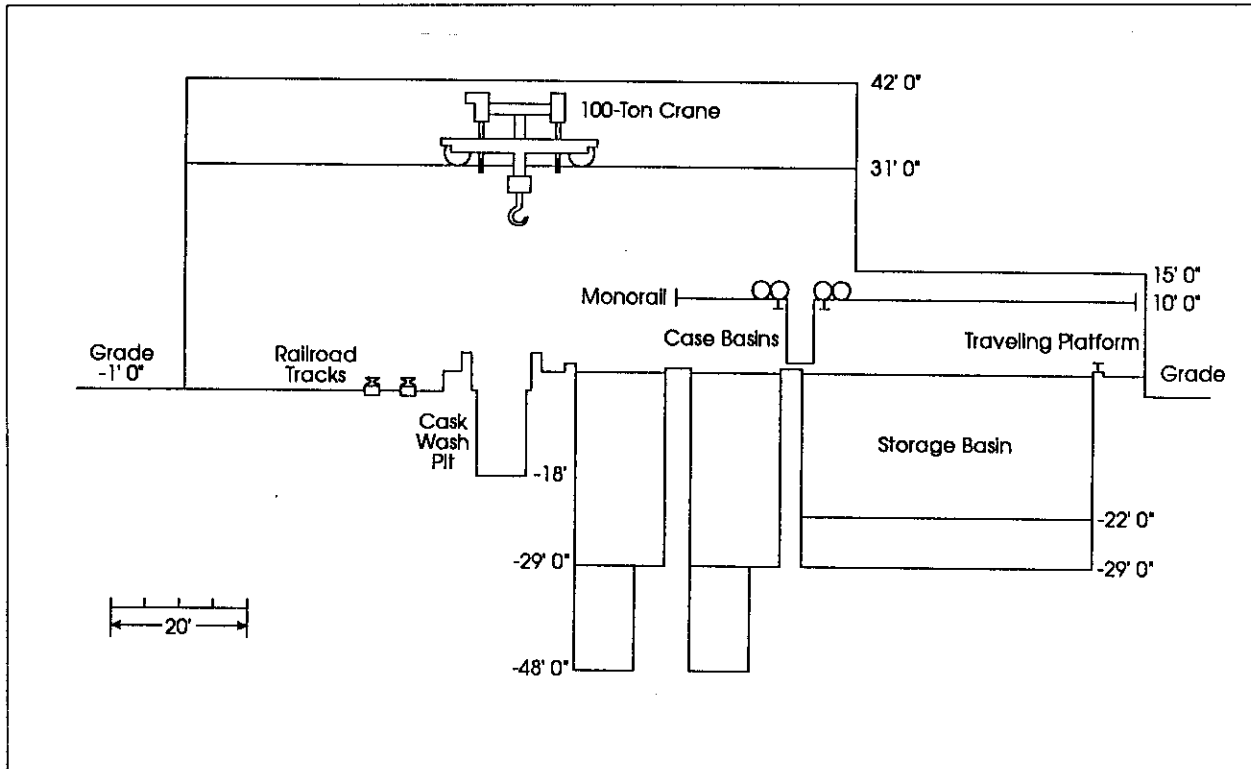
Elevation Schematic of the RBOF (Facing East)
